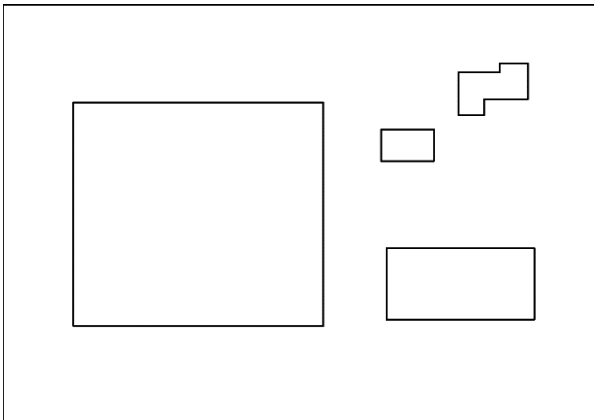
Example of a floor plan of a Brazilian Youth Prison - Form F
